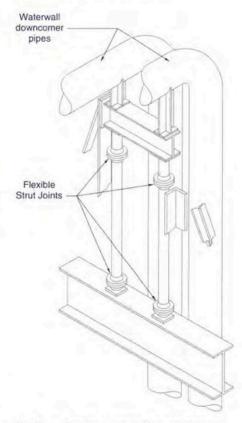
This is a supporting arrangement for boiler water wall downcomer pipes in a large steam generating station. Two Flexible Strut Joints are used as compression members. They eliminate the need for overhead hanger steel which would cantilever beyond the column. Conical action of the strut joints accommodates lateral and axial movement of piping.
